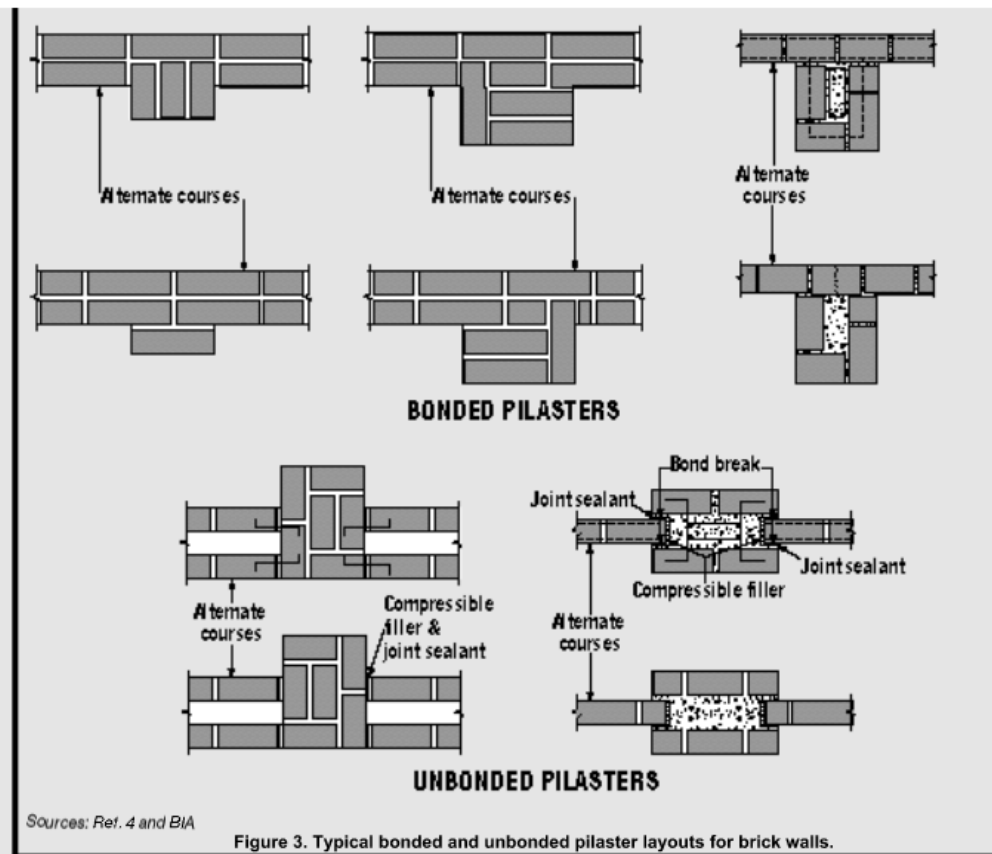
Typical bonded and unbonded pilaster layouts for brick walls.
